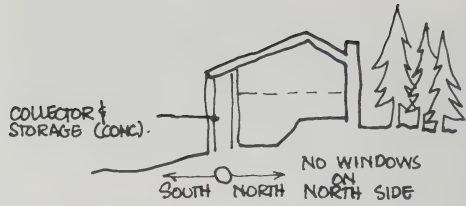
MASSWALL COLLECTOR/STORAGE
